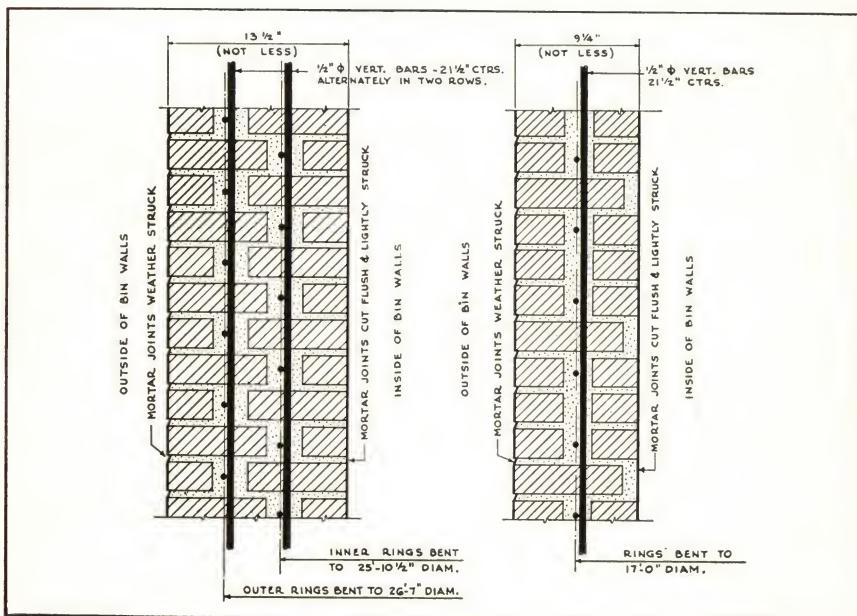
is the plan of these structures, and the wall sections shown in Fig. 1-3 indicate the amount and placing of the reinforcement.
